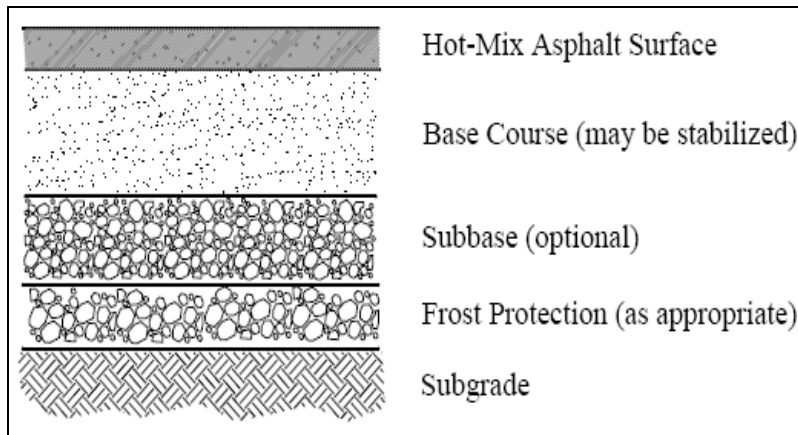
Typical flexible pavement structure (Atkins, 2003).
